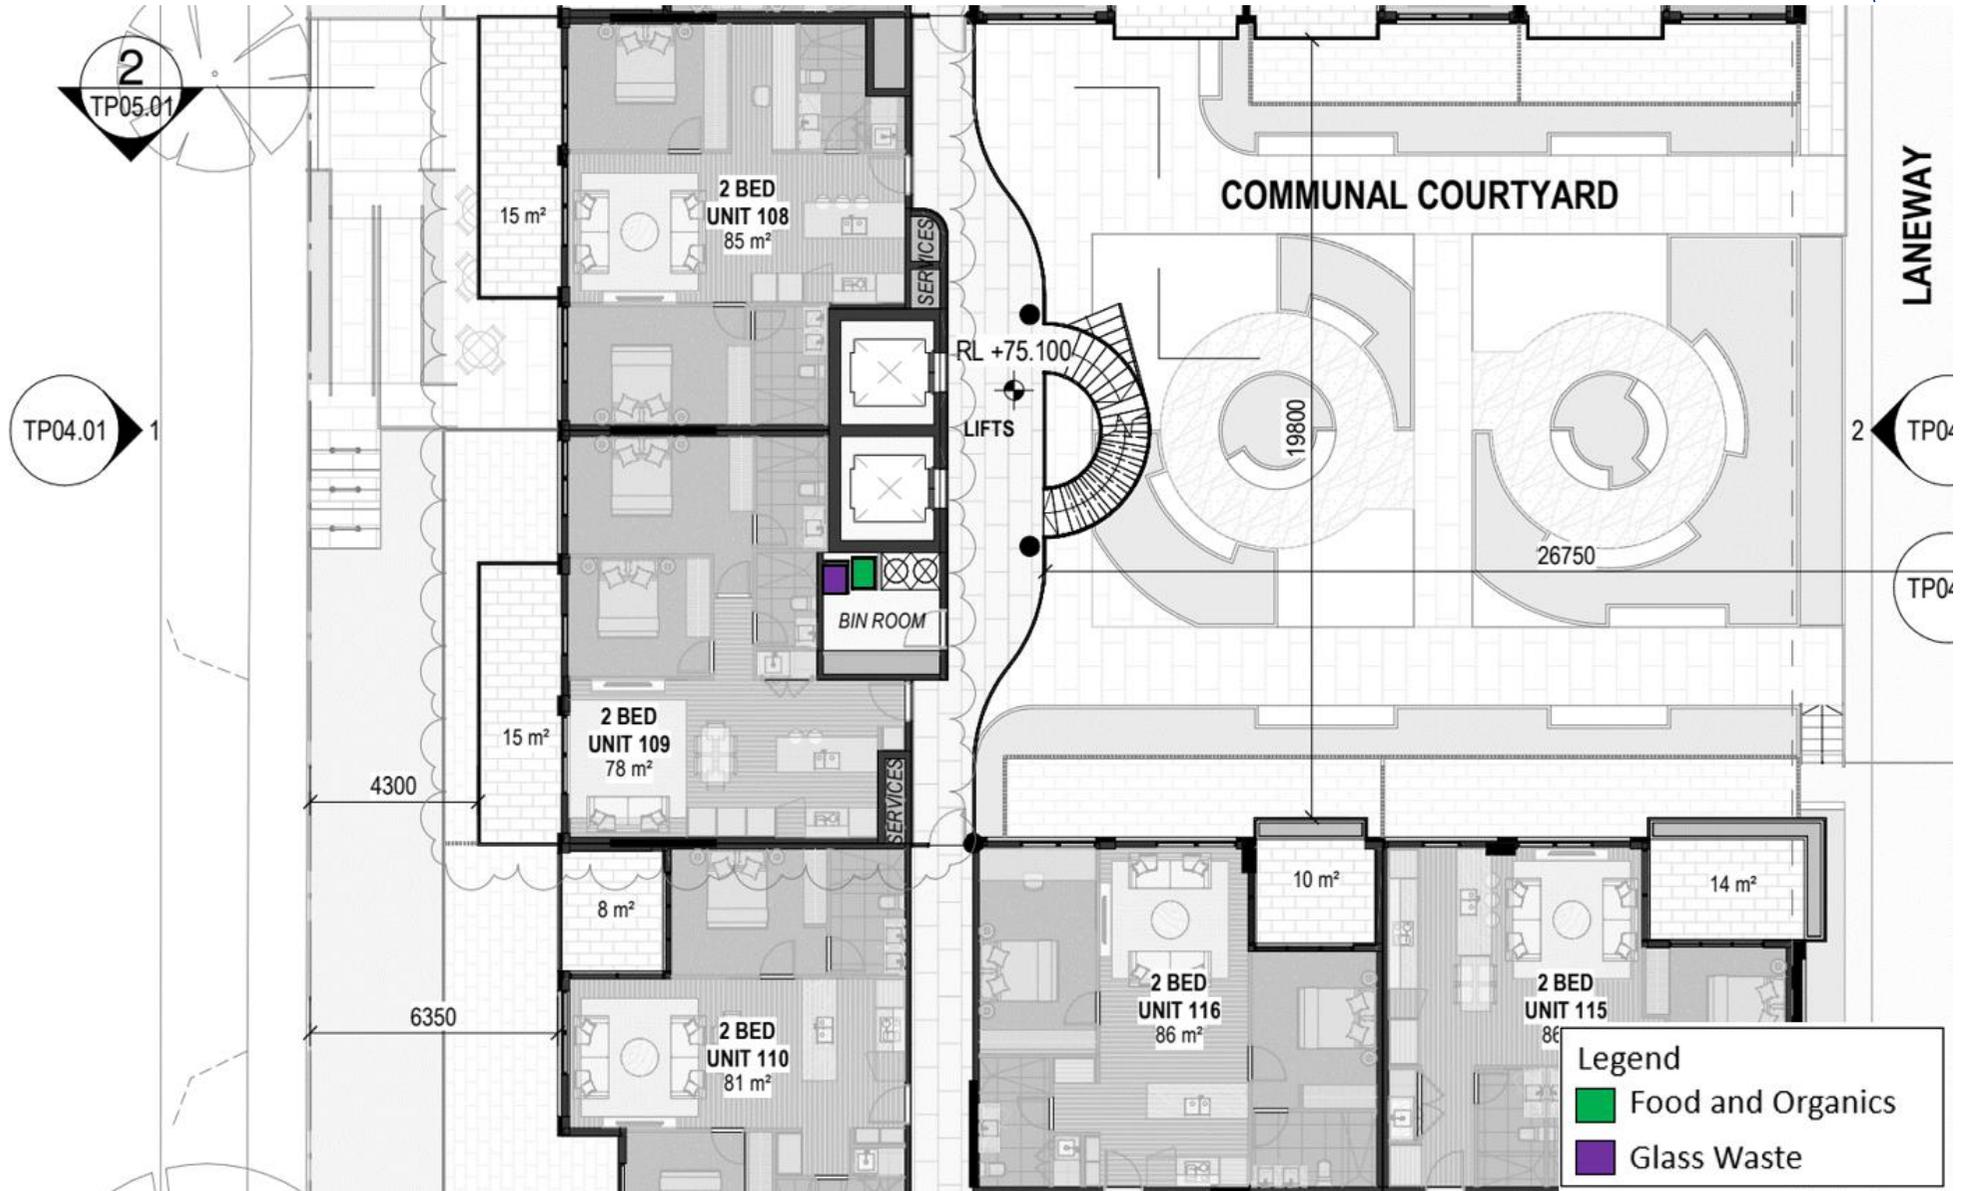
DEVELOPMENT PLAN – FIRST FLOOR BIN STORAGE AREA - FUTURE
